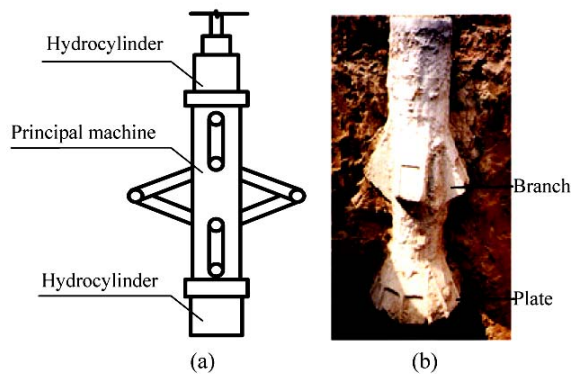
(a) Hydraulic squeezed tool; (b) Excavated out squeezed branch and plate pile
